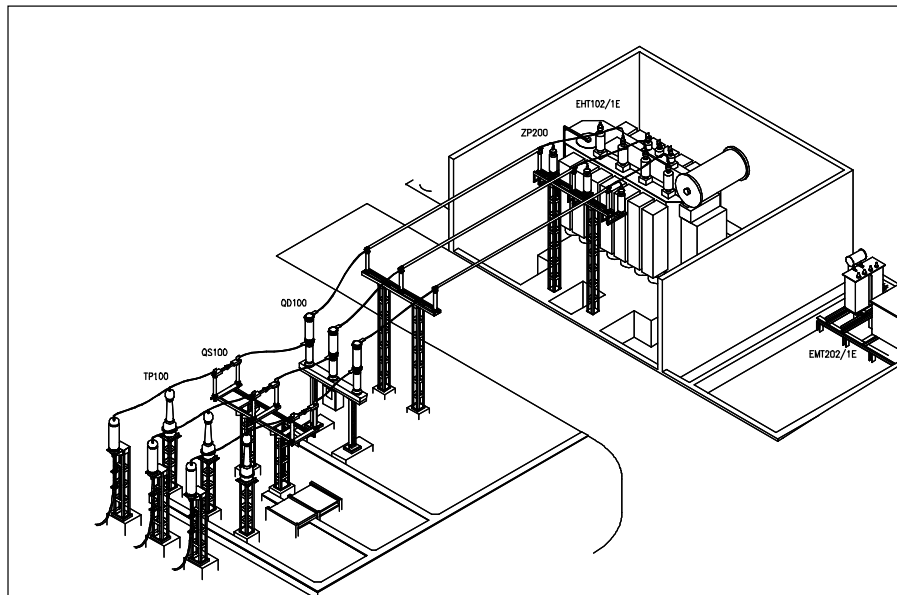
Layout of CERN's standard 66/18 kV substation
